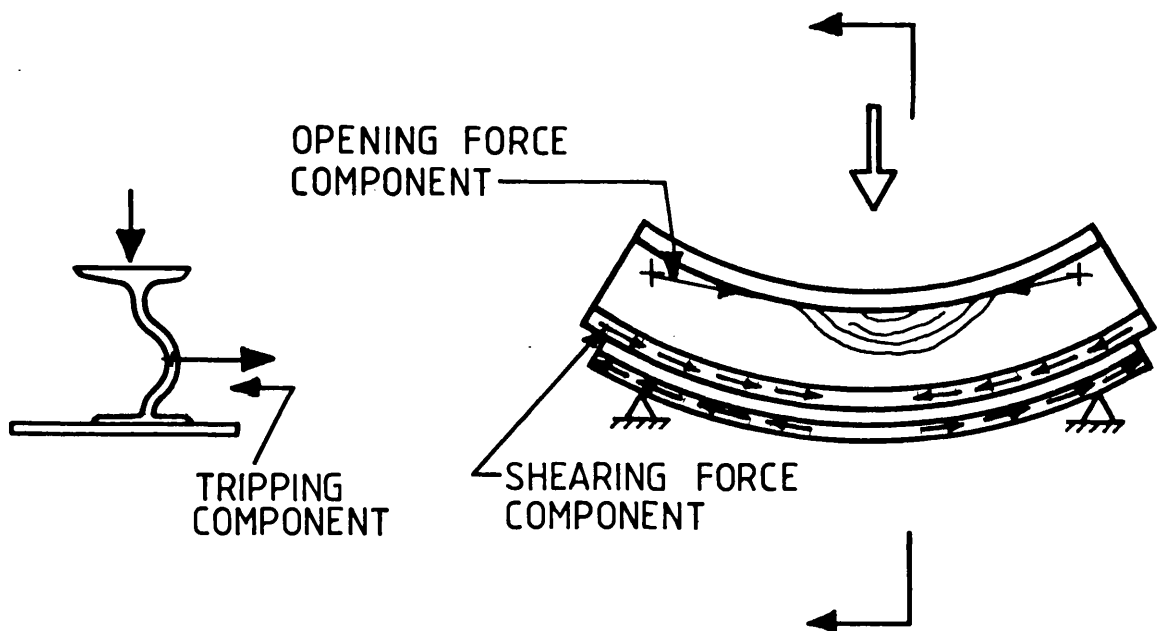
POSSIBLE FAILURE MECHANISM IN BONDED BEAM
